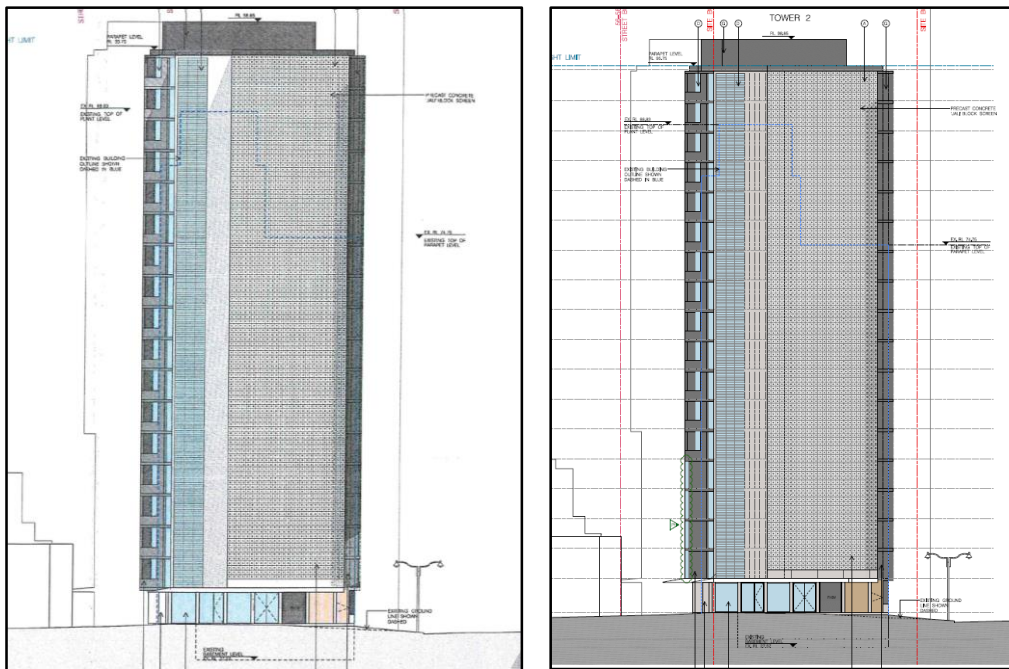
Tower 2 Eastern elevation (approved and proposed) Source: Candalepas Associates + Wendy Lewin
